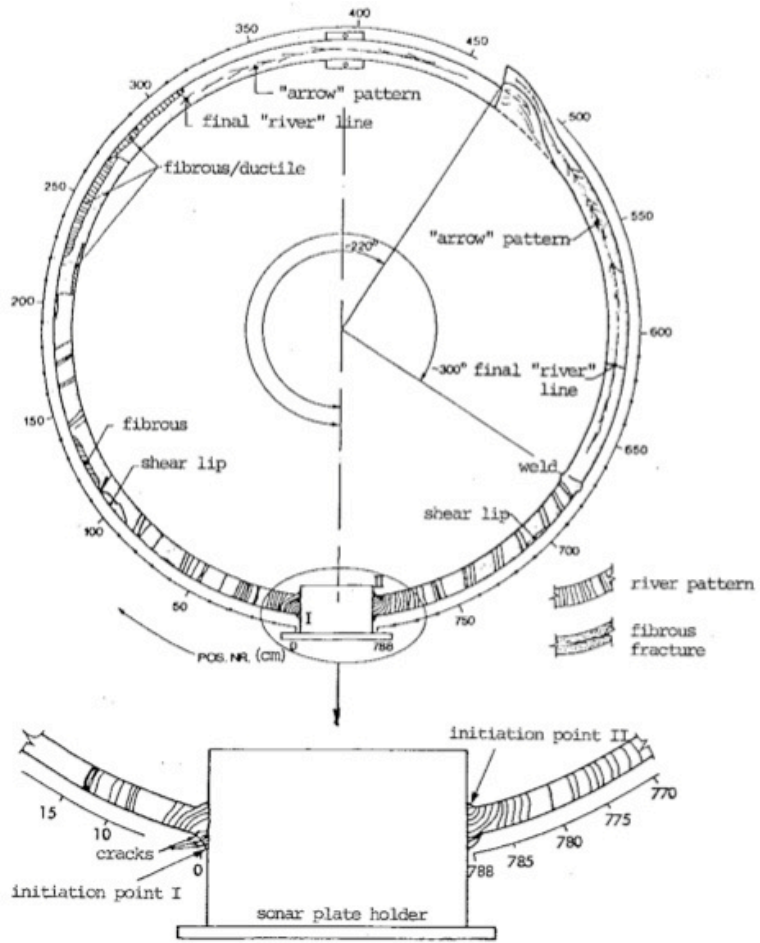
(a) The recovered bracing D-6. (b) A detail of the fracture position relative to the sonar flange plate. After ref. 37
